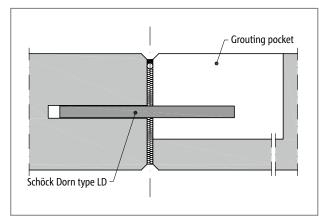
Schöck Dorn: Expansion joint formation precast concrete balcony
